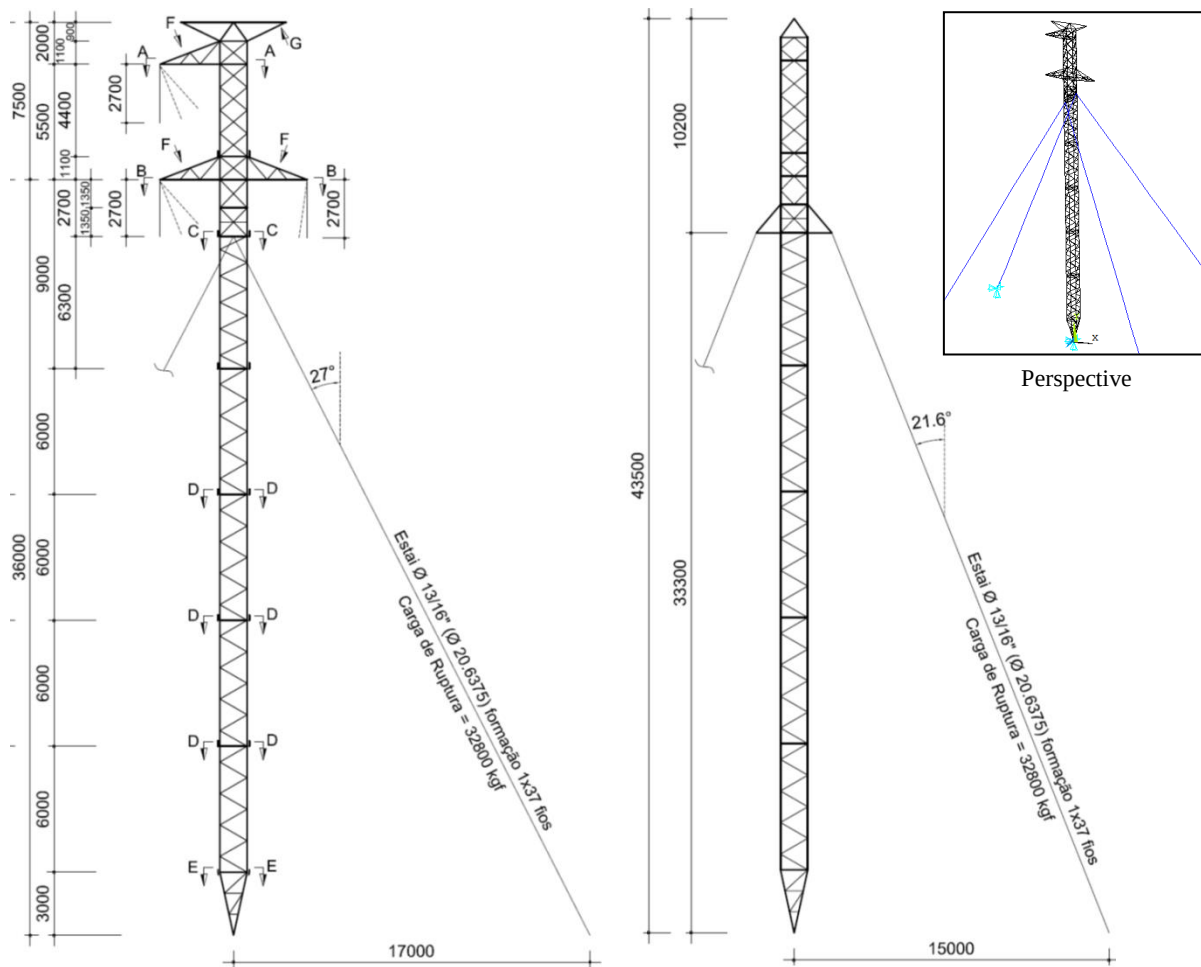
Front, side and perspective view of the guyed tower S1E2 with the structural configuration of the elements and other geometric details (dimensions in millimeters)
